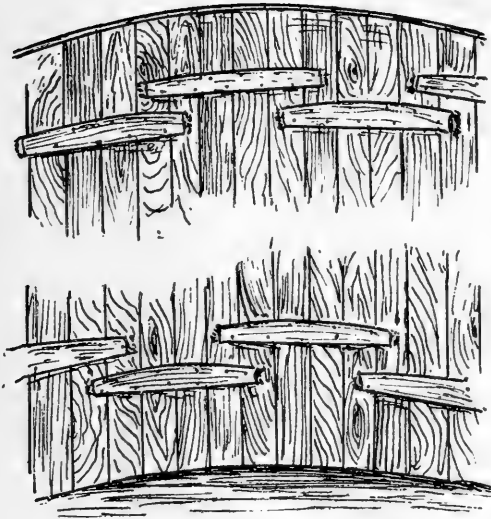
USE OF BARREL STAVES IN SETTING UP A STAVE SILO; THEY SHOULD BE REMOVED BEFORE THE SILO IS FILLED.
